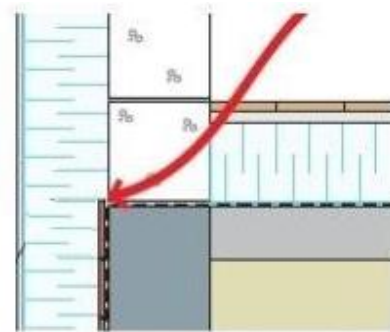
The place the occurrence thermal bridge in place of connection foundation wall with the wall of building.
